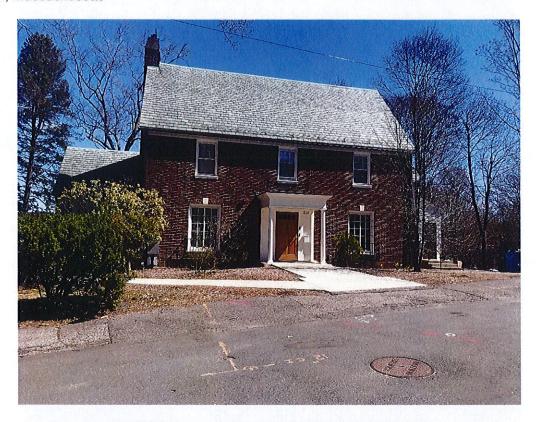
EXISTING BUILDING (FRONT)
